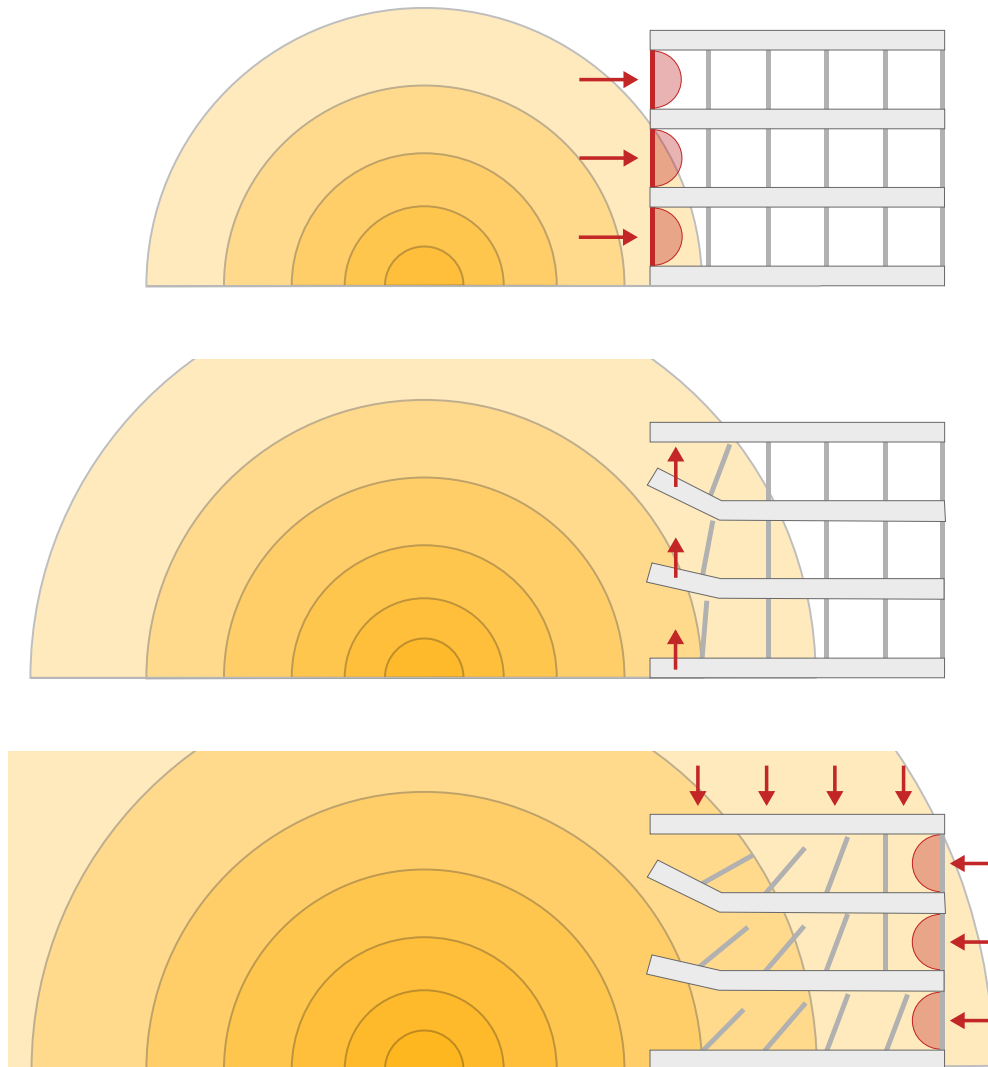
The sequence of building damage following an explosion. 1) The blast wave breaks through the façade, damaging windows and walls. 2) The wave enters the building and infill pressures force floors upwards. 3) The structure is surrounded by the blast wave. Downward and side pressures are experienced by the roof and walls [142].
